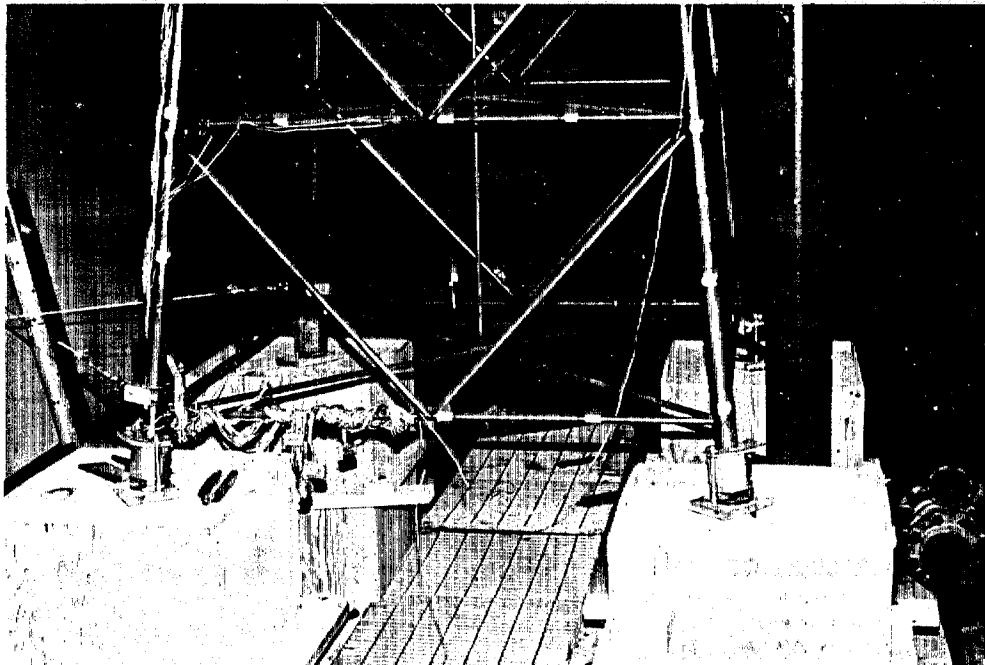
OFFSHORE PLATFORM MODEL, 1/14 SCALE, SOIL FOUNDATION CONDITION
